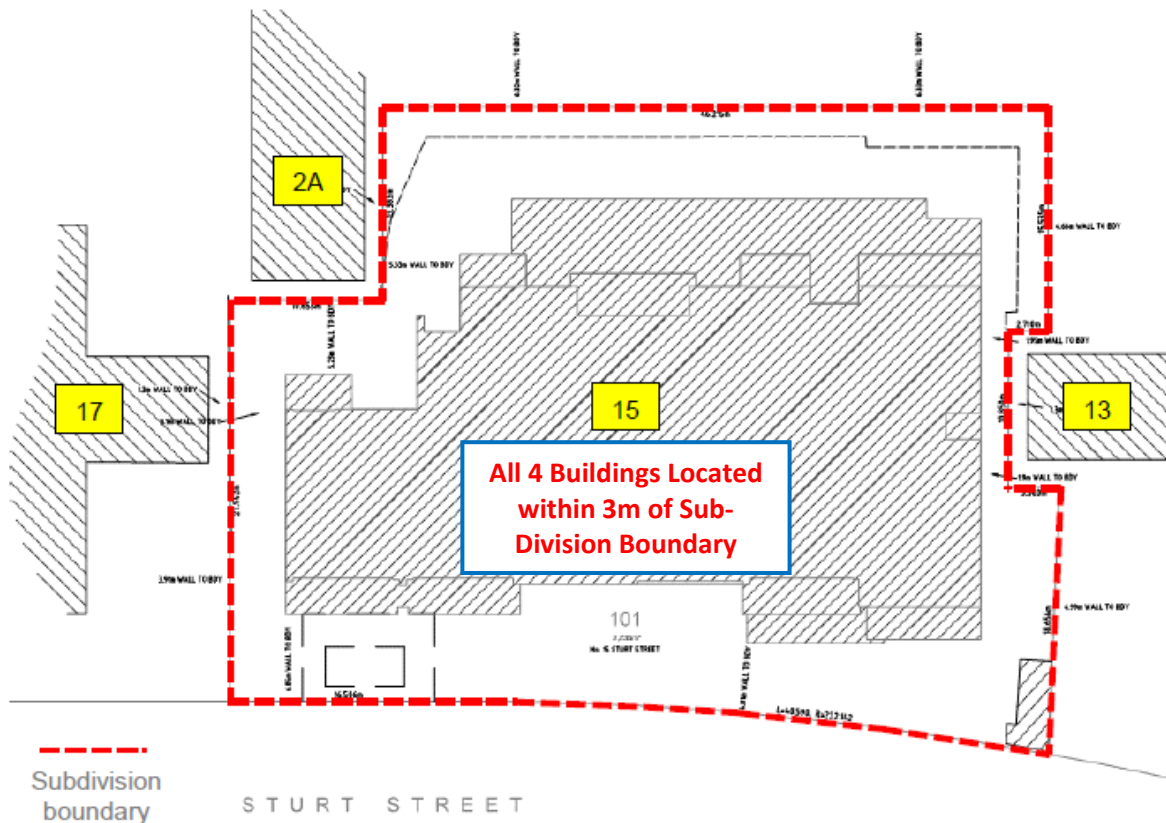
Site Plan with Proposed Sub-Division Boundaries
